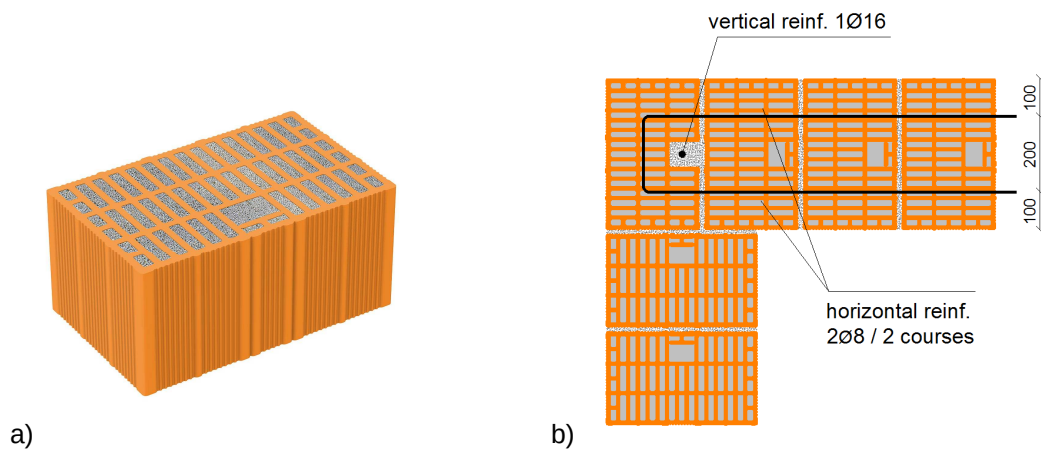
Reinforced masonry made with insulation filled clay blocks: a) solid view of Normablok® Più S40 MA and b) wall corner detail.
